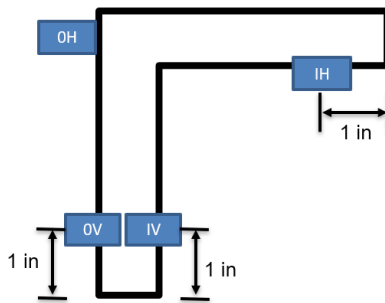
Revised Strain Gauge Placement on Top Struts
